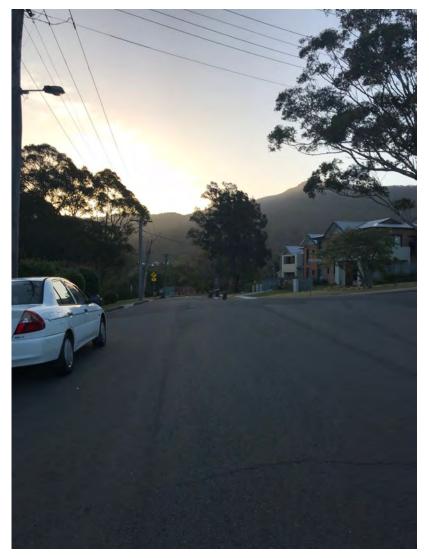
Sightlines to 39 Angel Street Driveway – Looking North
